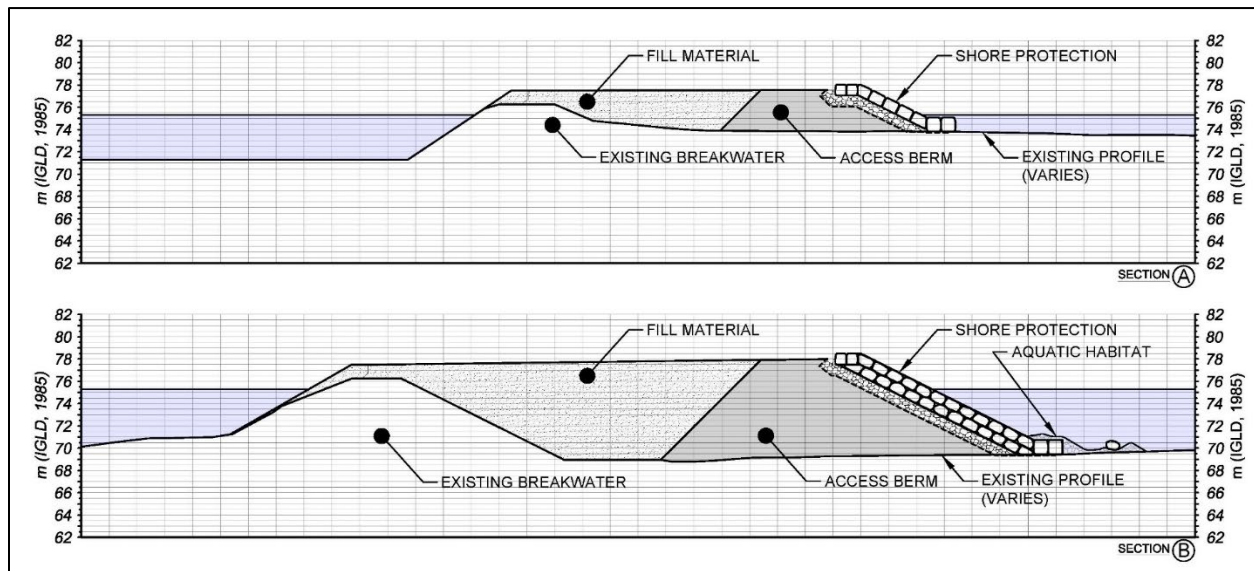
Armour Stone Revetment Typical Cross-Sections
